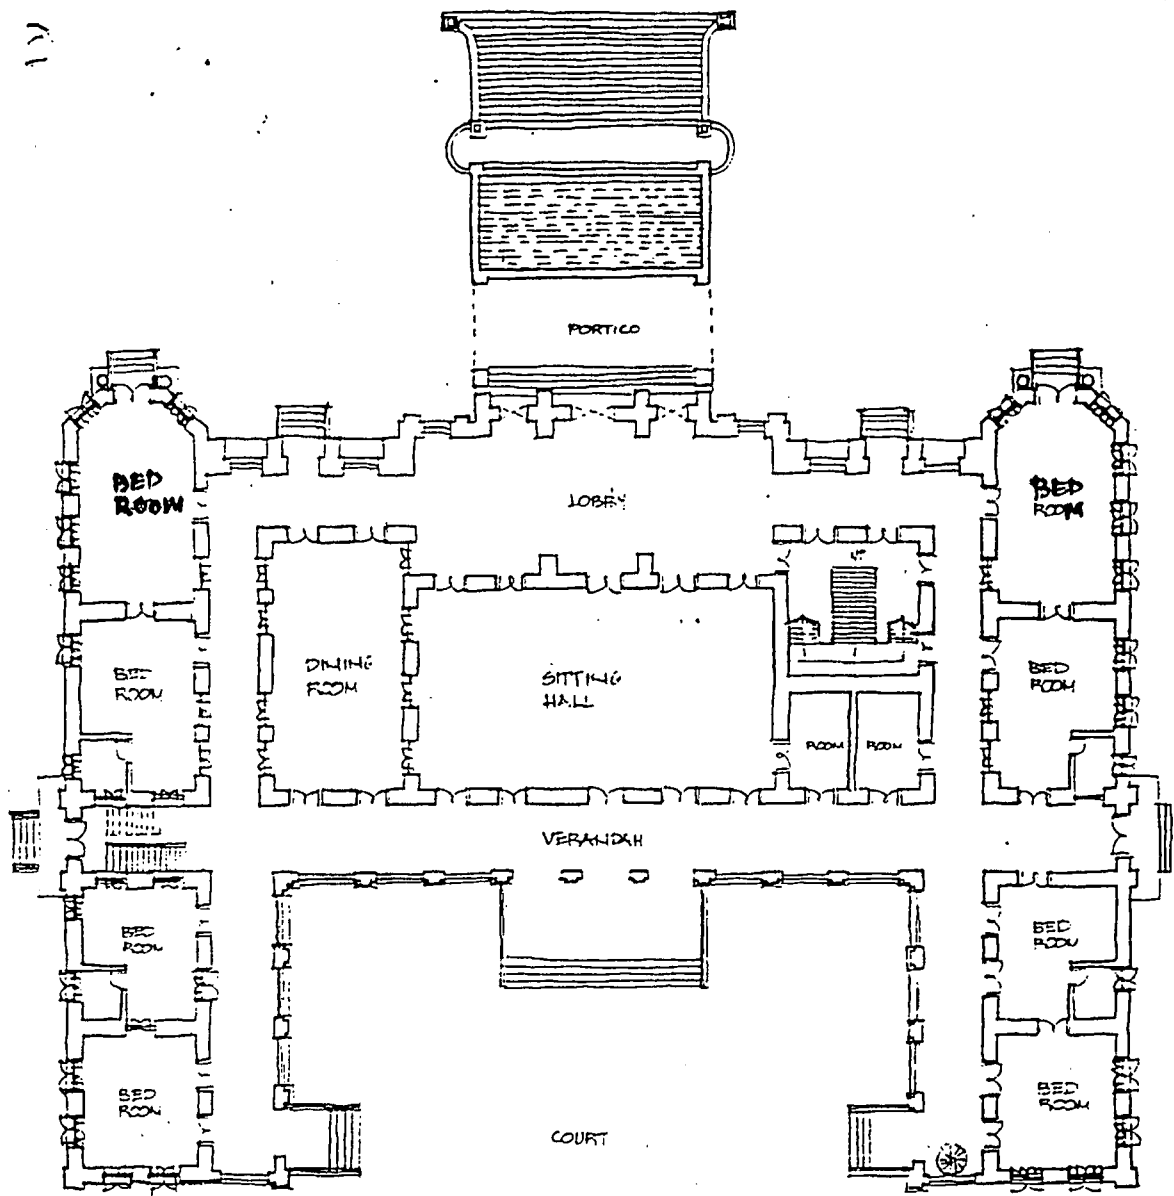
Ground floor plan Tajhat palace, Rangpur
